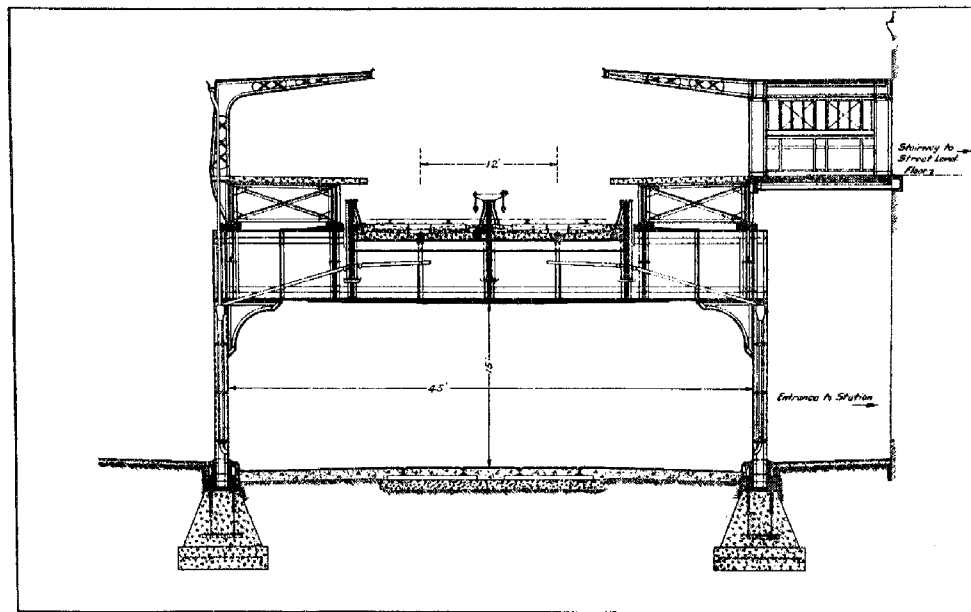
Double column ballasted deck elevated railroad—cross-section at station (Philadelphia type).
